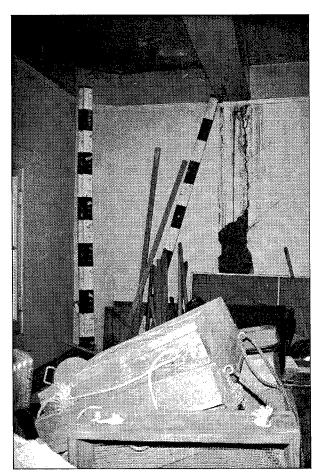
One wall of the collections storage area in Storage Location 2 has been damaged by water. Note also the piles of miscellaneous equipment cluttering the floor.
